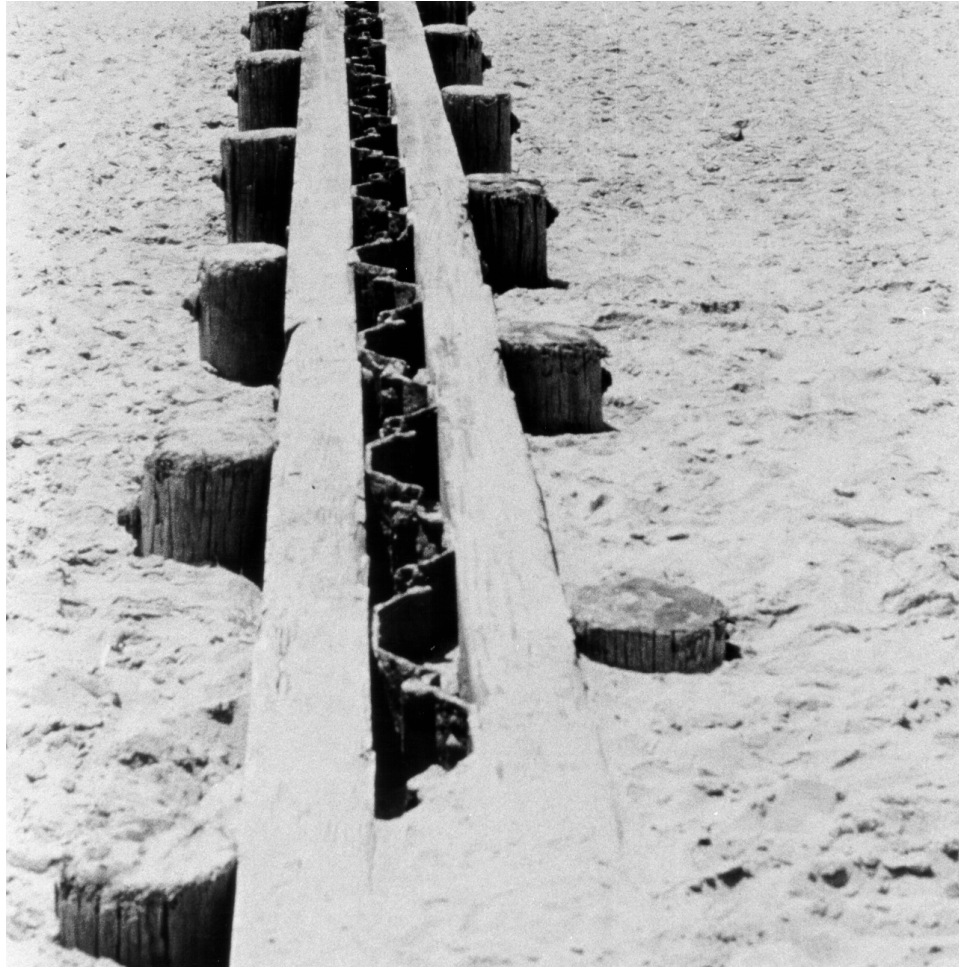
Timber sheet-pile groin, NASA Space Flight Center, Wallops Island, Virginia
